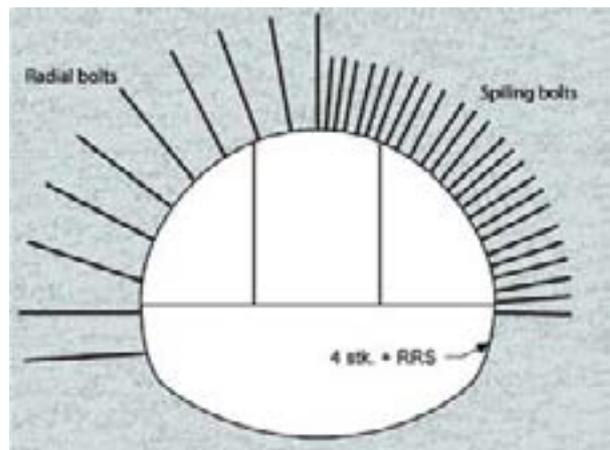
Working with a divided cross section and support using spiling bolts and sprayed concrete ribs
